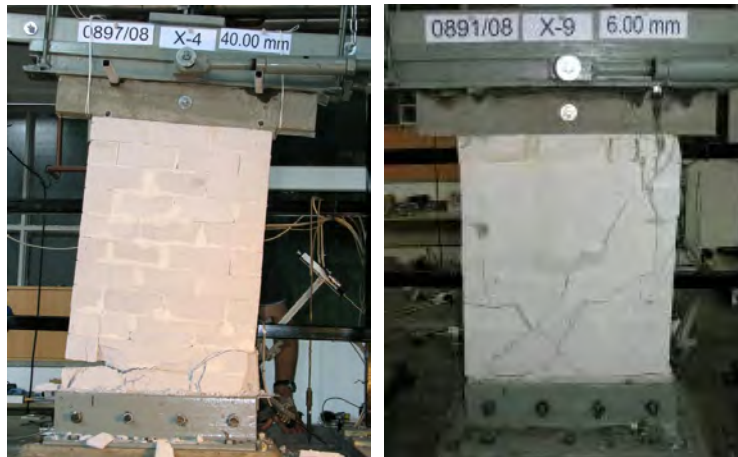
Flexural failure of a plain (left) and shear failure of a confined masonry wall (right) [55].
